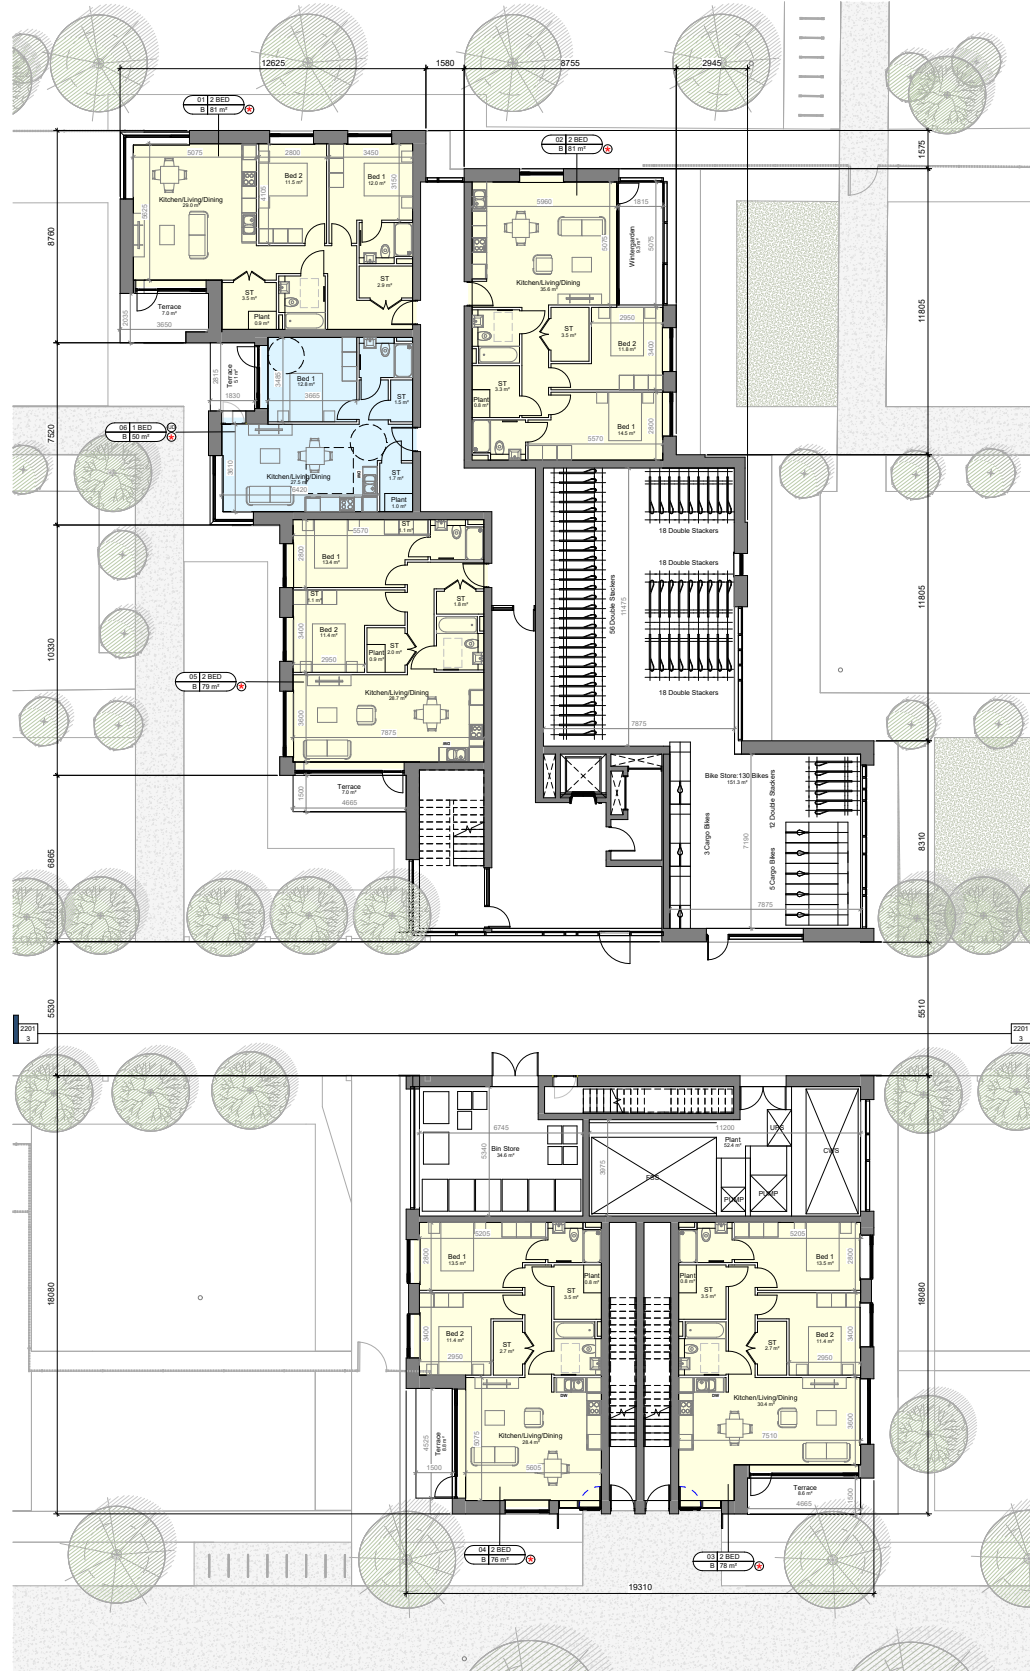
Block B - Ground Floor Plan Source: MCORM, 2026.
